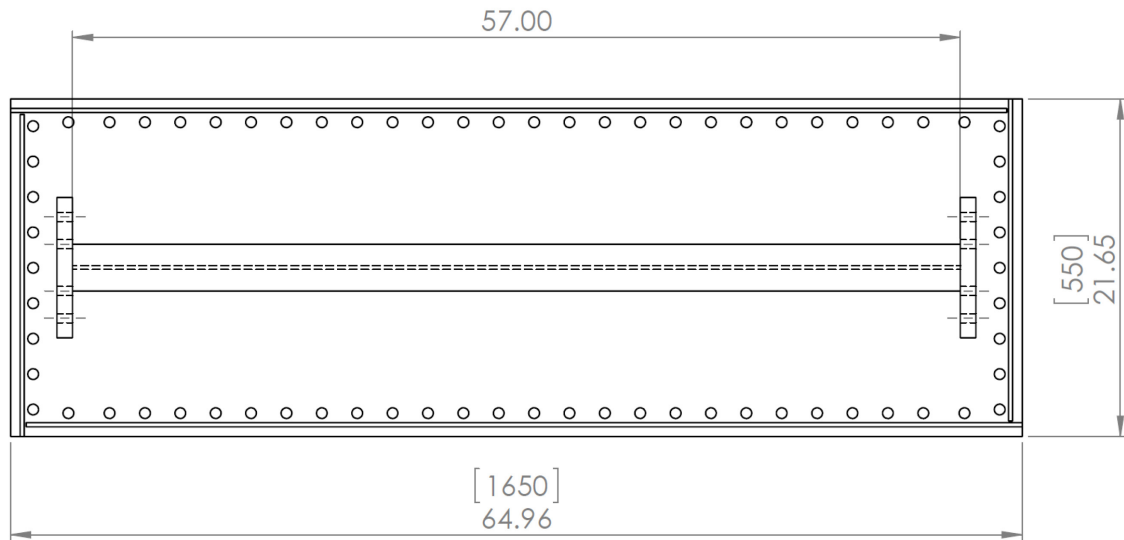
Plan view of frame test specimen (units are inches; bracketed units are mm).
